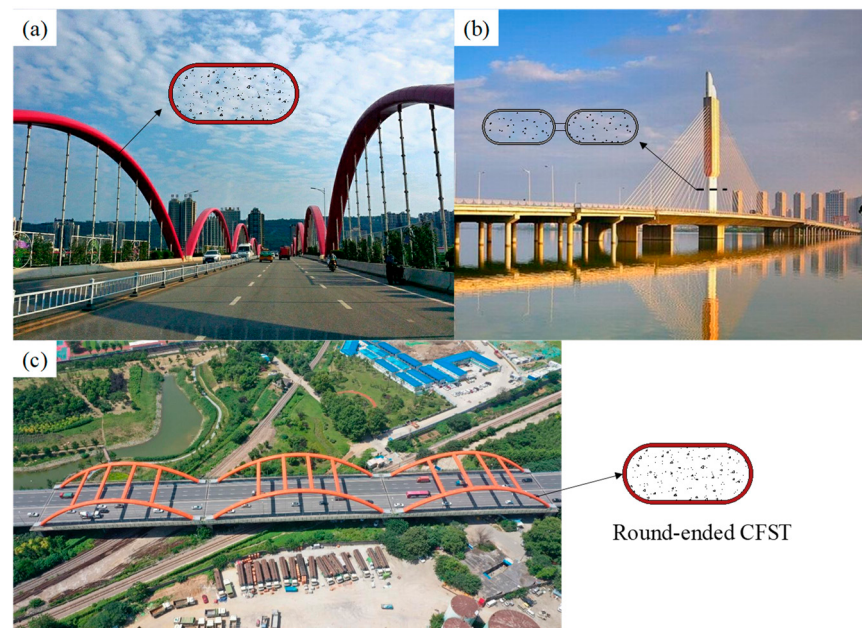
Application of RECFST: (a) Houhu Bridge; (b) Weihe Bridge; (c) Qixia Bridge.
